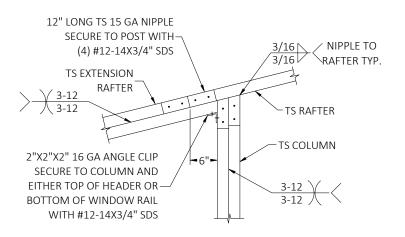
A SIDE EXTENSION RAFTER/COLUMN CONNECTION FOR RAFTER SPANS LESS THAN 12'-0"
